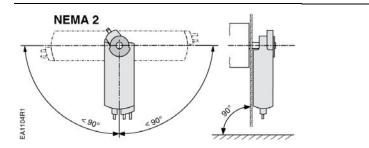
Acceptable NEMA 2, IP54 per EN 60 529 Mounting Positions.
